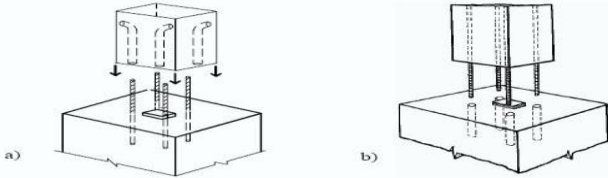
Column base connections with projecting reinforcement bars in grouted sleeves, a) bars projecting from the base, b) bars projecting from the column
